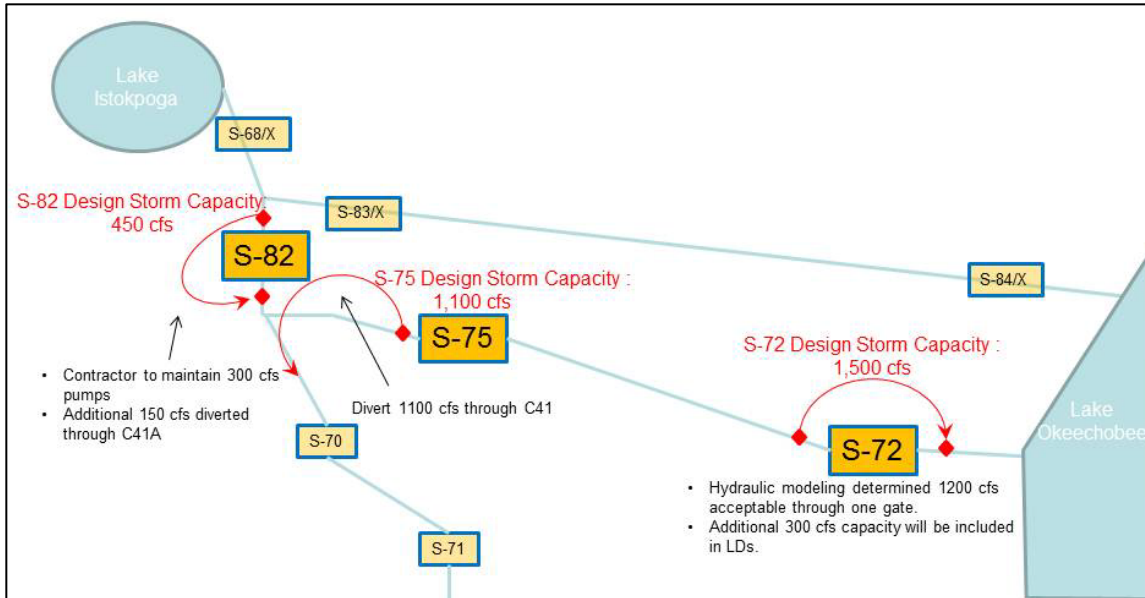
Wet Season Flow Routing and Bypass Pumping Plan
